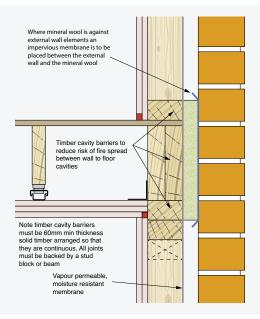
FRL 120/120/120 Fire-protected timber frame wall /floor junction with integral cavity barriers – beams perpendicular to wall.
